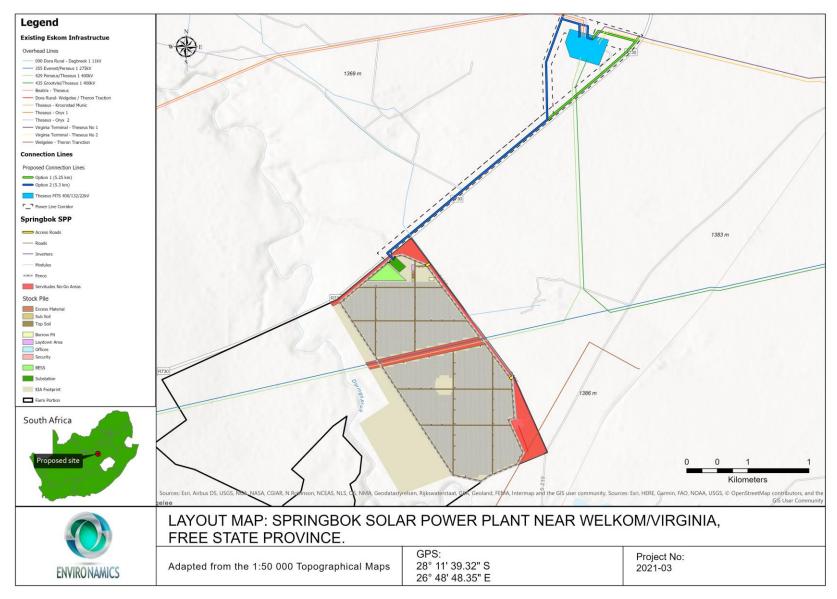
Layout plan indicating site boundary, plant boundary and internal roads
